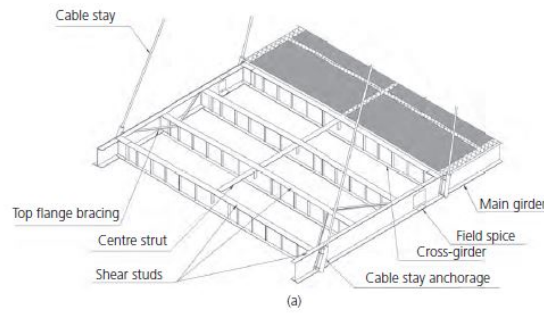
Typical composite cable-stayed deck structure. [4].
